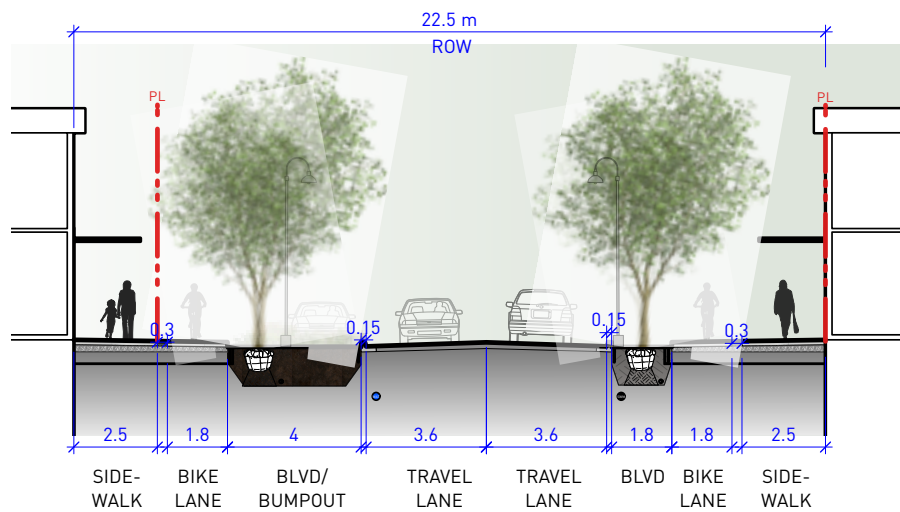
ENLARGEMENT 5 - TYP. STREETSCAPE AND LANEWAY
